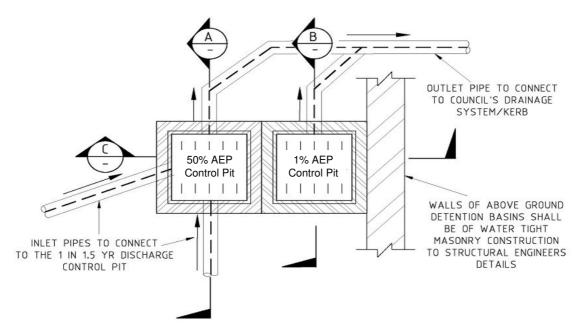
Concept Outlet Arrangement (after UPRCT, 2005)
